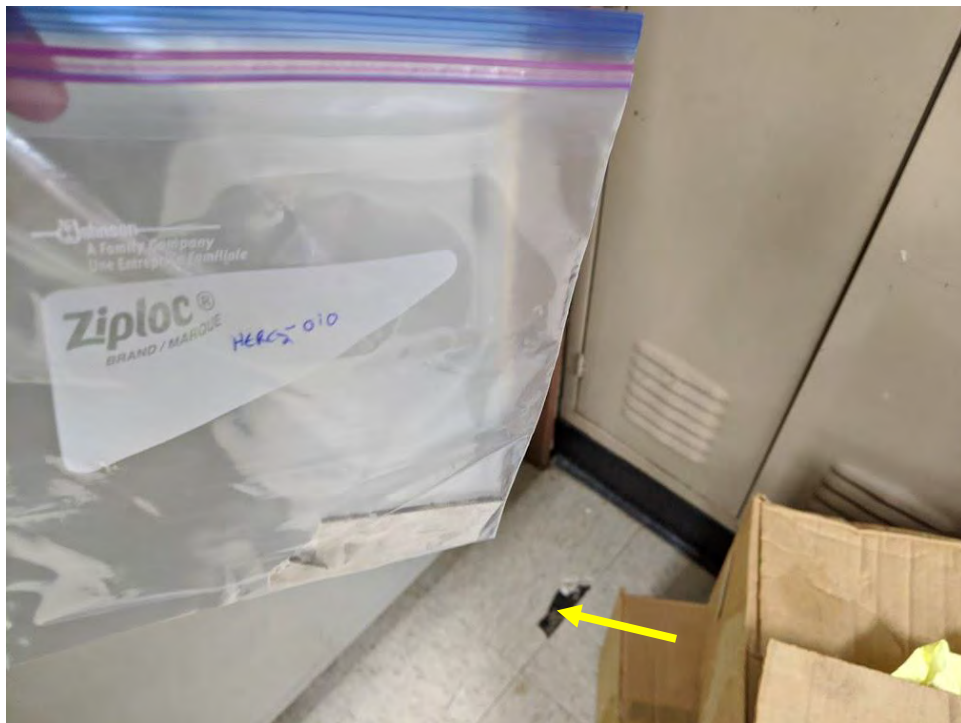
This photo shows sample location HERC 2-006 which is of ACM grey floor tile and black mastic under the floor tile in the storage closet.
